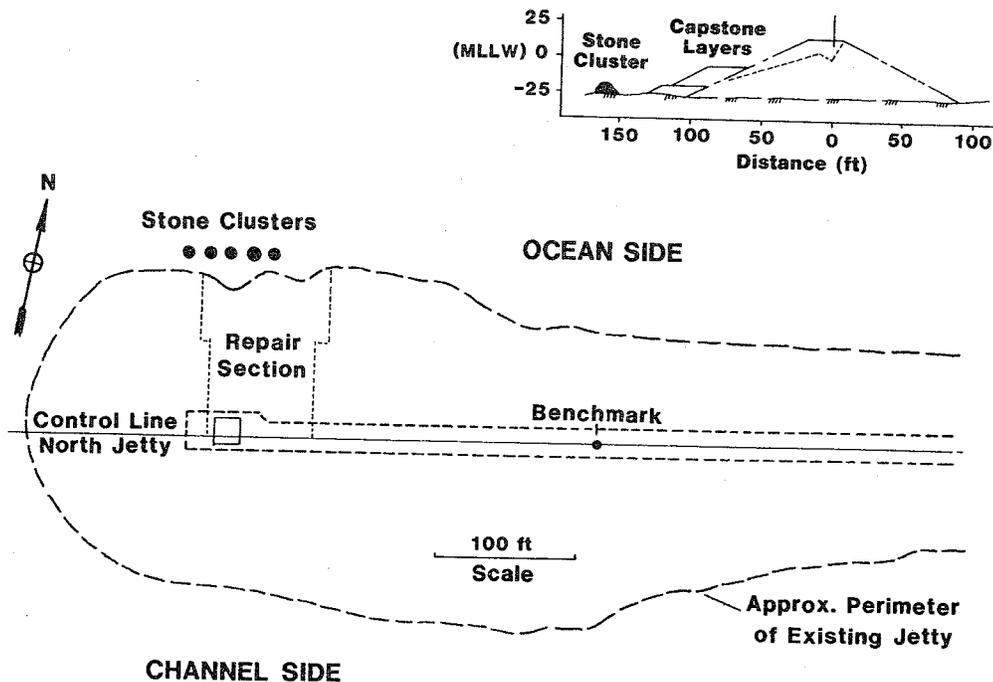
Plan and cross section of the jetty repair project at Mission Bay, California. Positions of the stone clusters in relation to the jetty structure are not to scale
